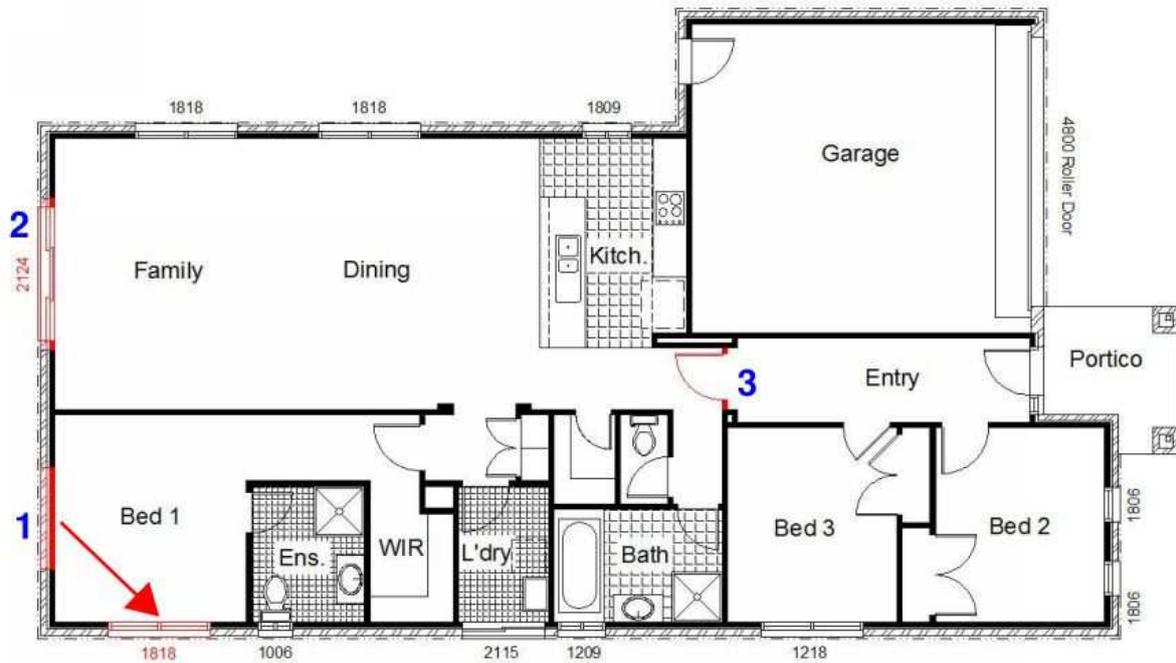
Redesigned floor plan for Dwelling 5 in Brisbane.
